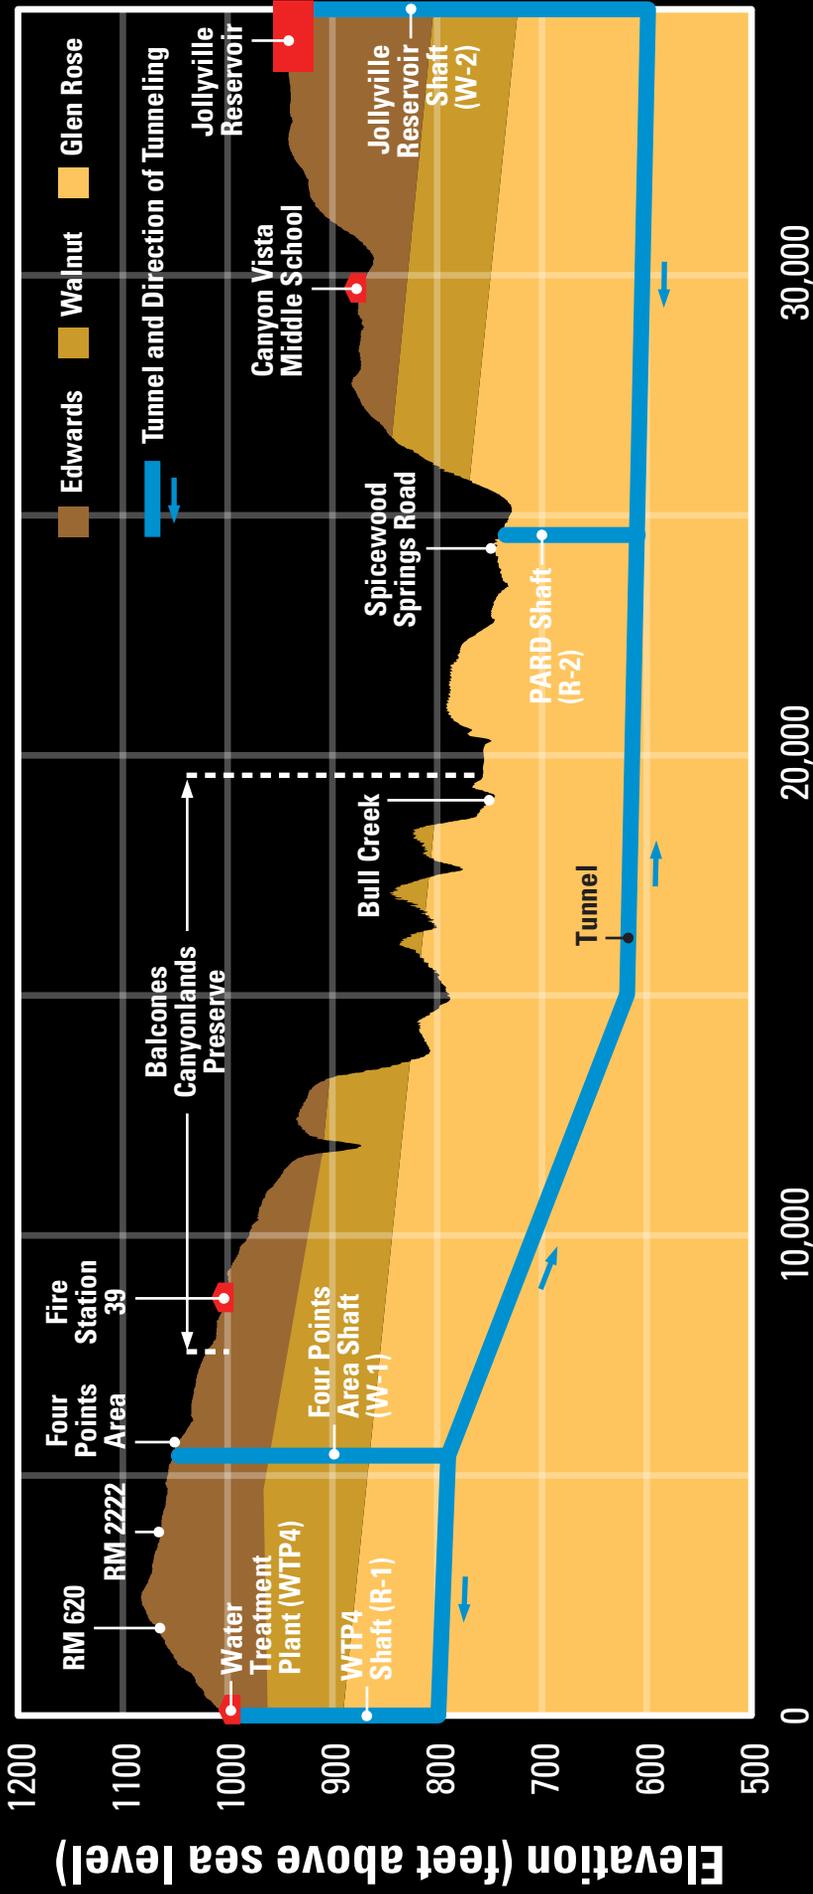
Jollyville Transmission Main Proposed Vertical Alignment
